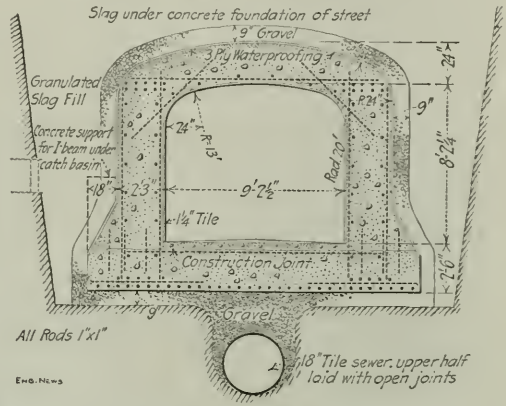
CROSS-SECTION OF PASSENGER SUBWAY
